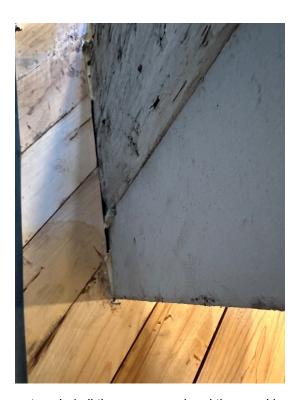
Posts are not sealed all the way around and the wood beams are very porous
